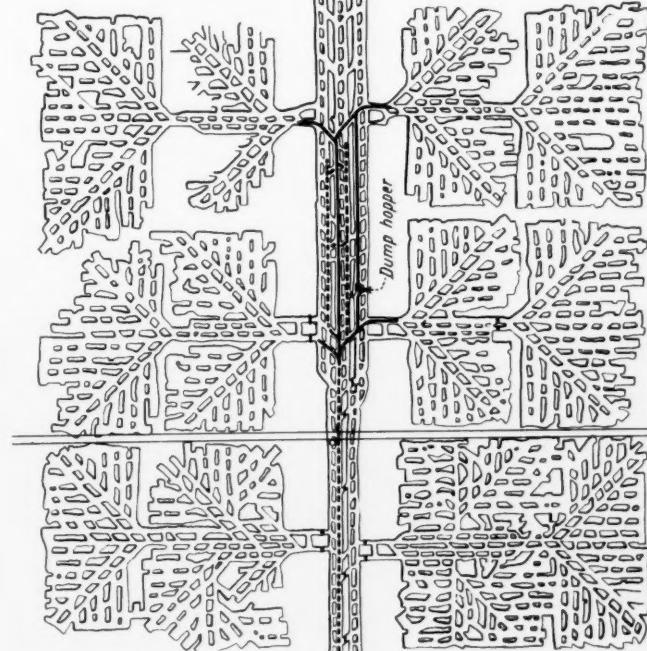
Drilling plans for 26-ft. rooms and sheared headings, Kings mine.
